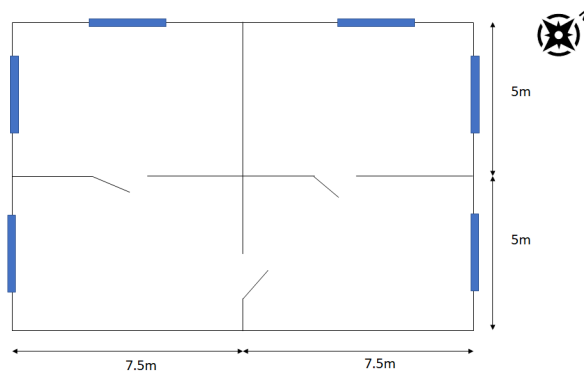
Plan 2D and dimensions of the studied dwelling.
